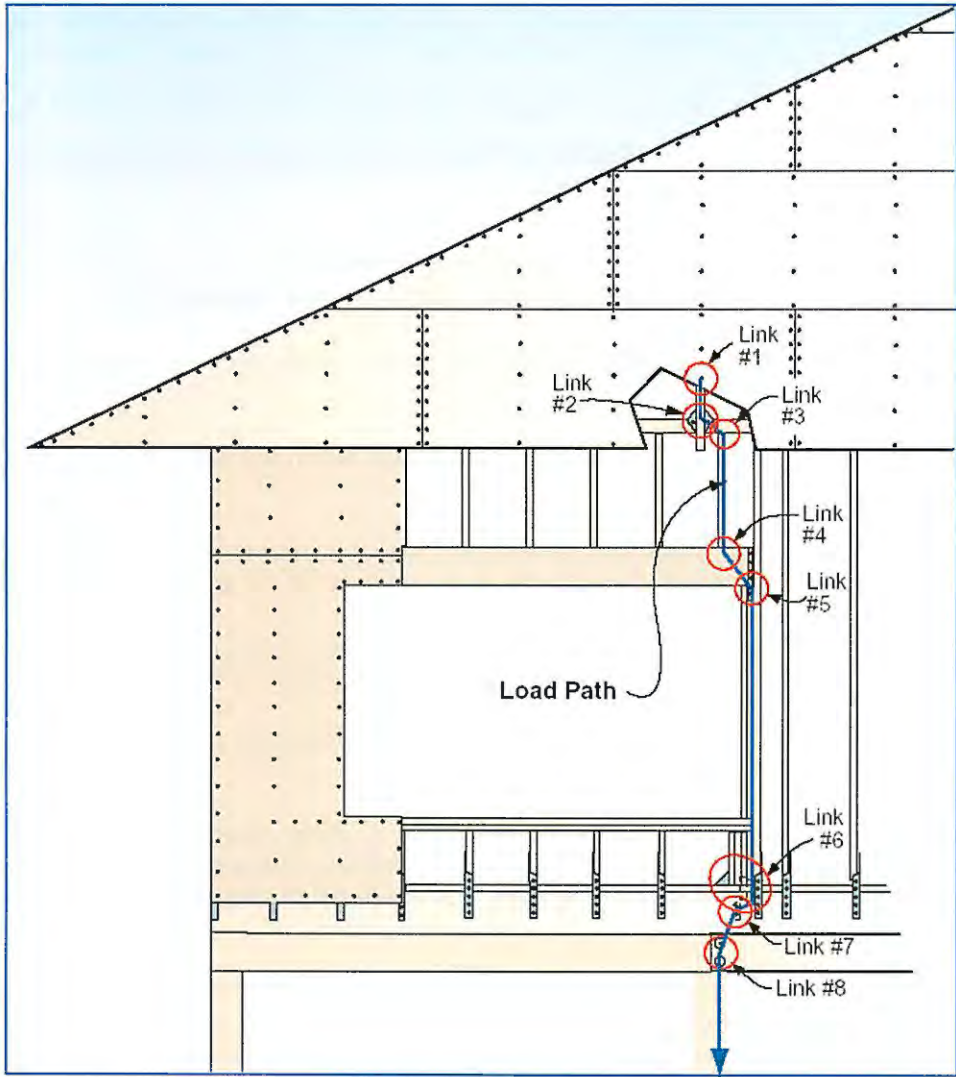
Continuous Load Path Connection from Roof to Foundation. The connections for key components of a house must be sufficient to resist loads and be continuous from the roof to the supporting pile to the foundation. Information on the proper connectors for links 1 through 8 is in the FEMA CCM 2000.
